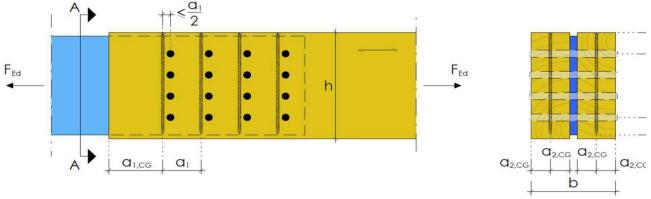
Dowelled steel-to-timber connection with outer timber members and reinforcement
